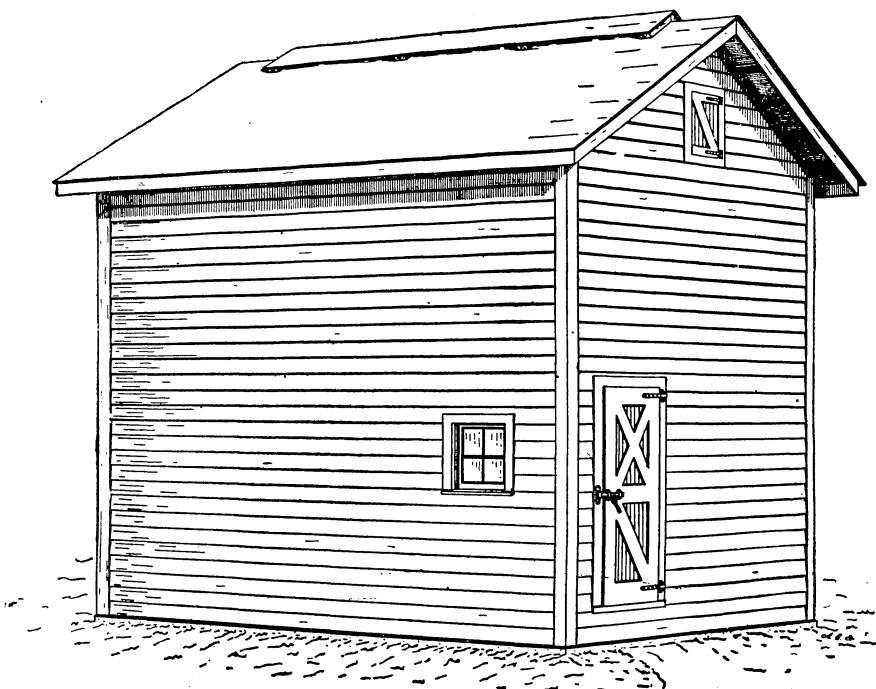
Wooden ice house, with milk room, insulated with sawdust or mill shavings. (Perspective view.)
